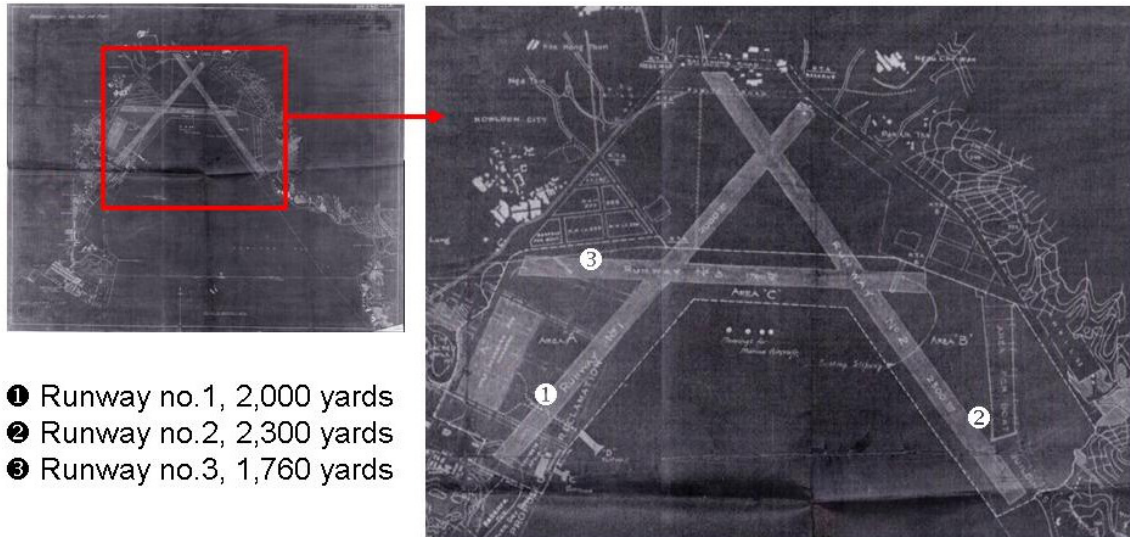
Plan of Kai Tak Airfield's proposed expansion, 1938. (Source: HKRS163-1-356)
